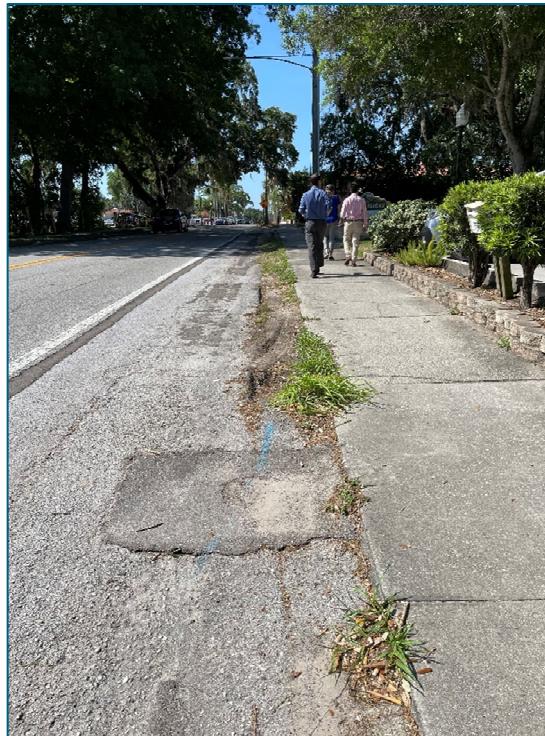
Pavement in Need of Repair on Philippe Parkway
